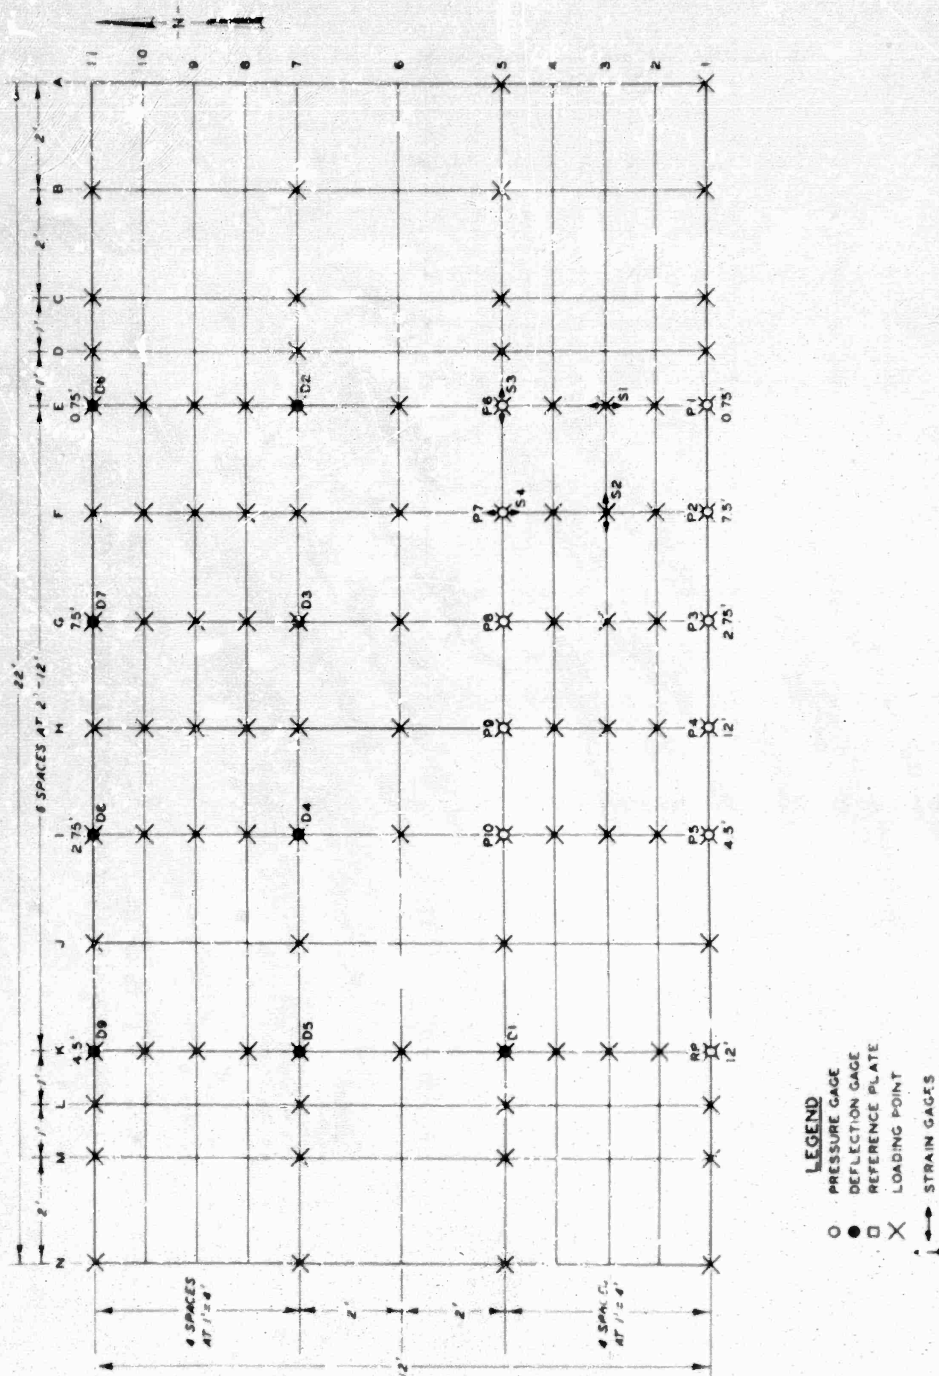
Static Load Grid System, Item 4, Flexible Pavement Tests. Instrumentation
